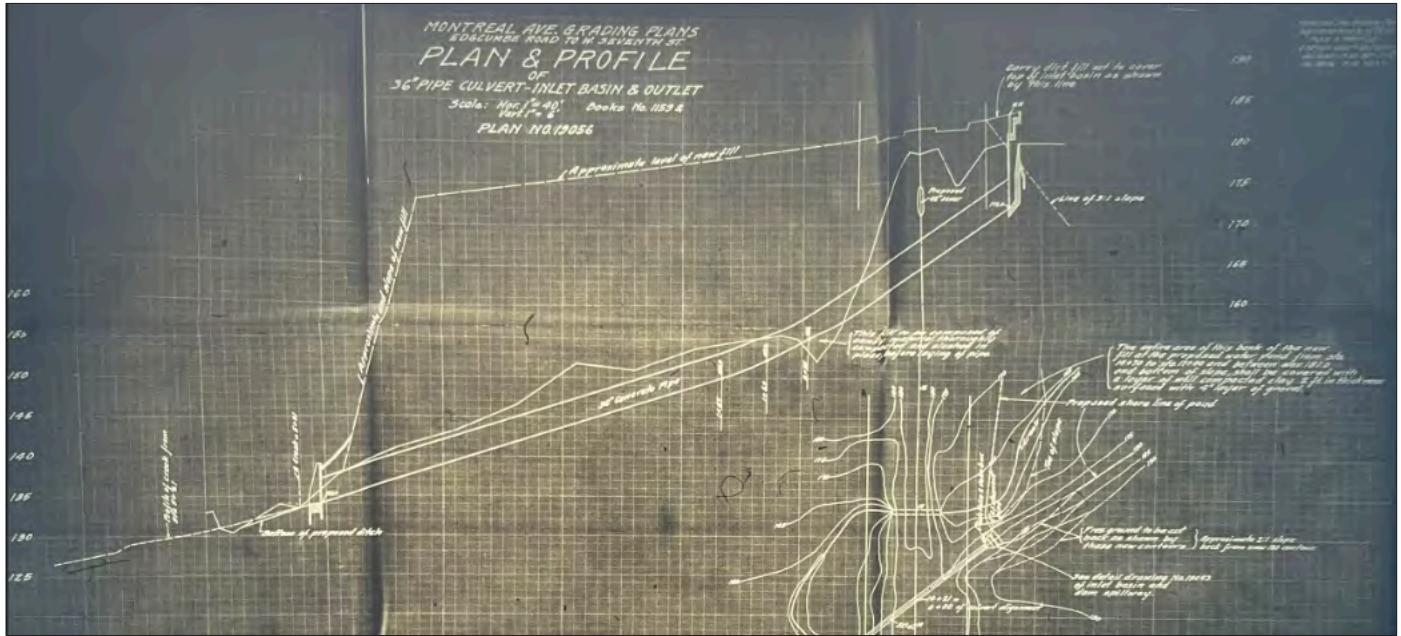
Profile of Mickey's Ravine in 1926, showing the 40-foot-thick plateau of fill burying the 36-inch concrete pipe carrying Highland Creek
